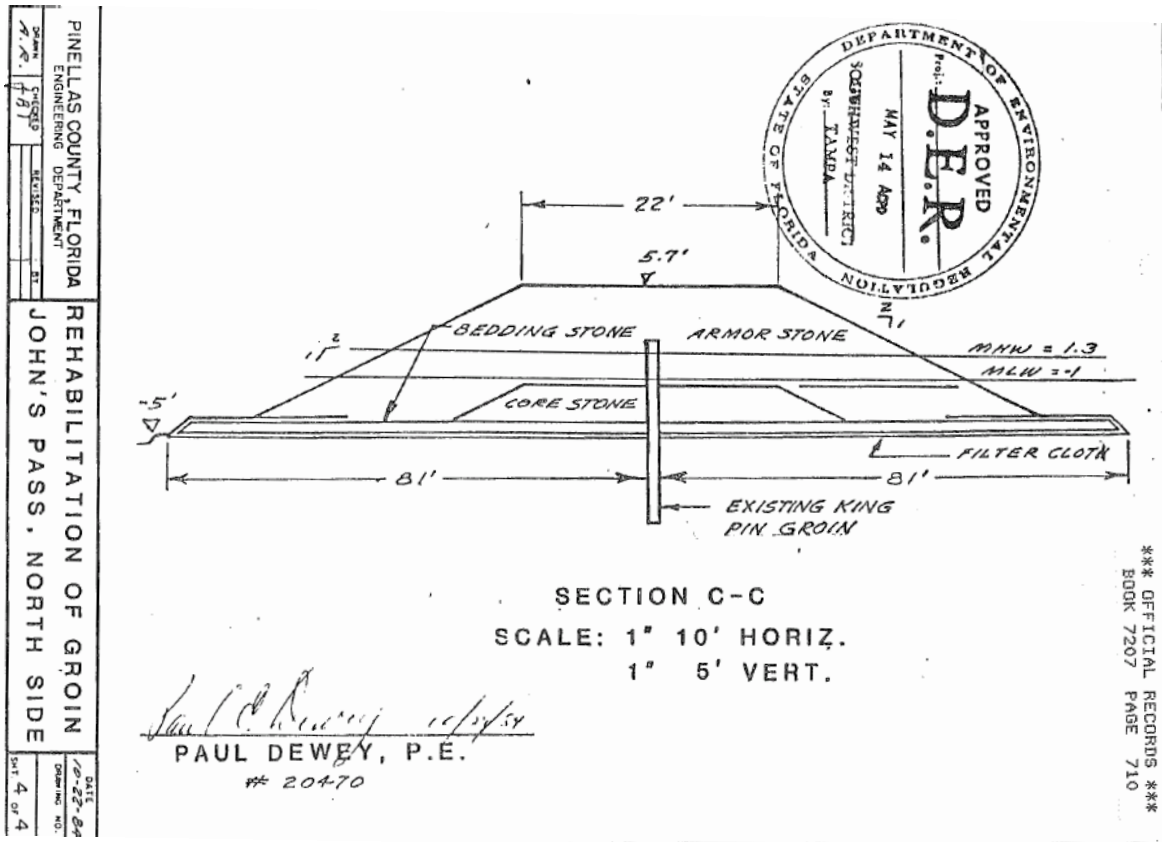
John's Pass Terminal Groin Typical Cross-Section
